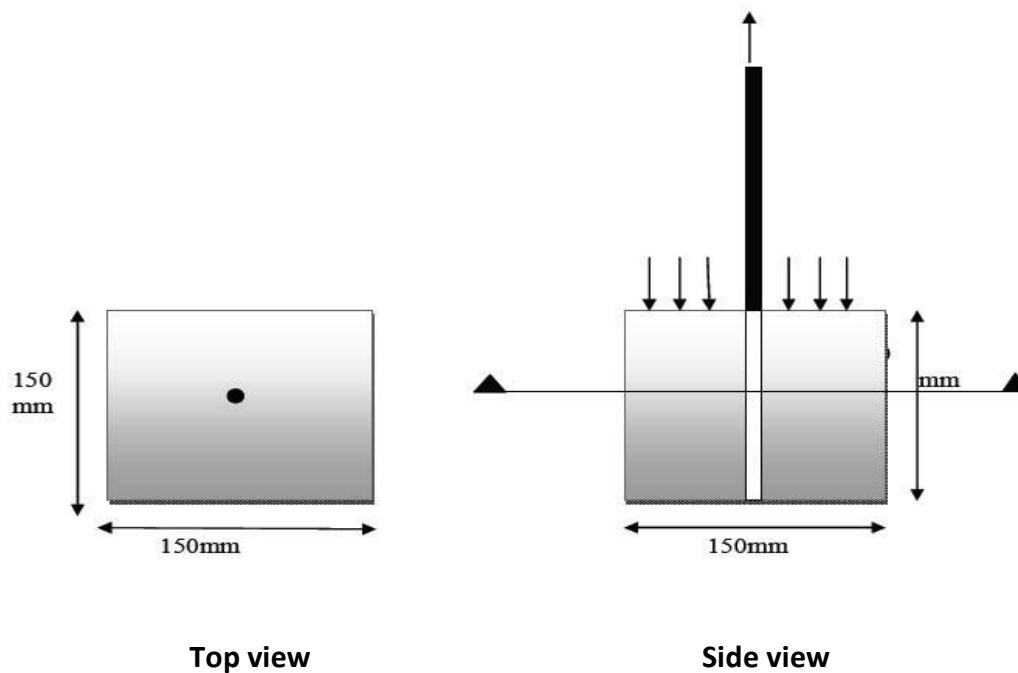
The dimensions of pull out test specimens, the location and the length of embedded deformed steel bar in concrete specimens
